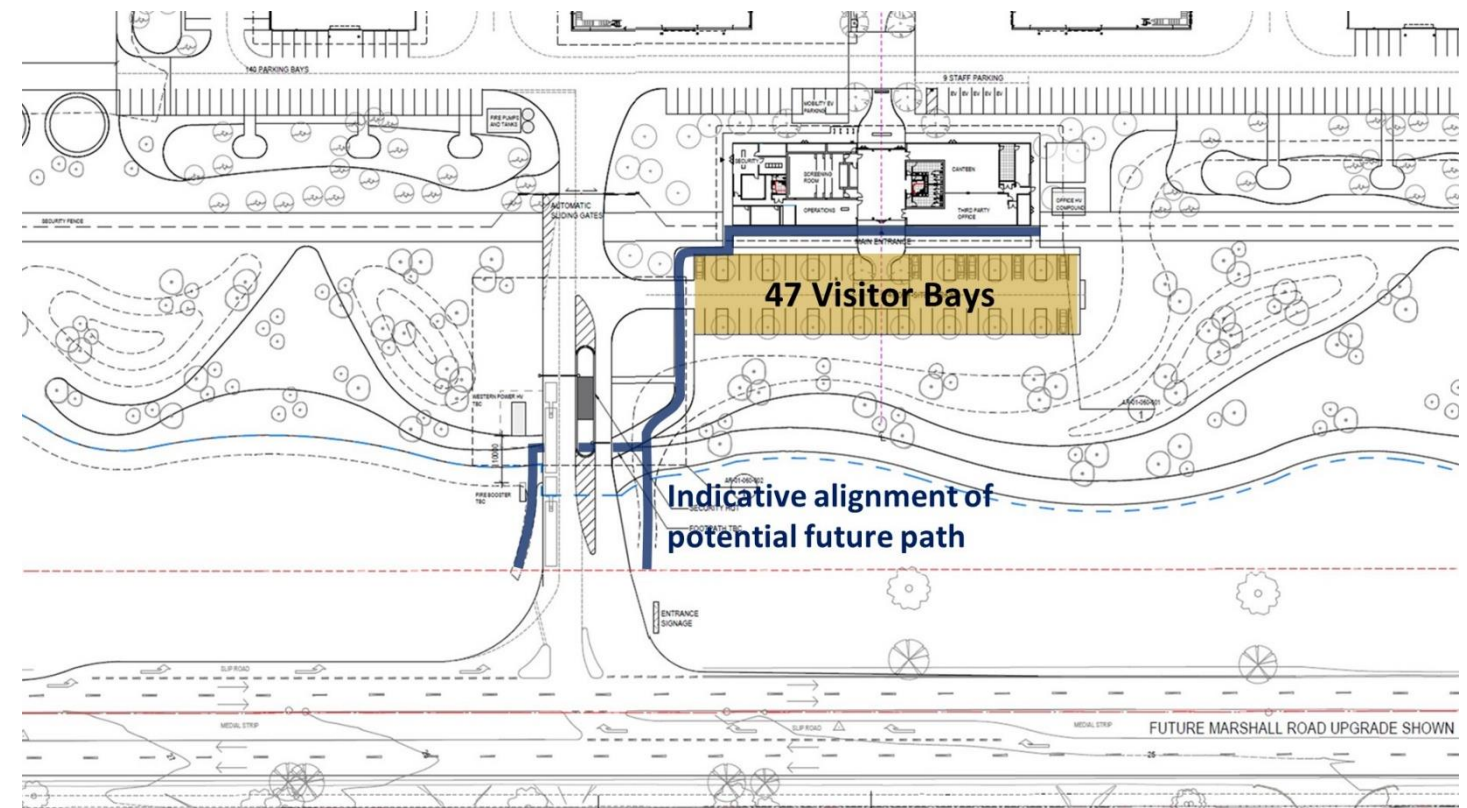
Indicative alignment of a connecting path from Marshall Road to the Malaga Site office building (source: Hassell, January 2023)
